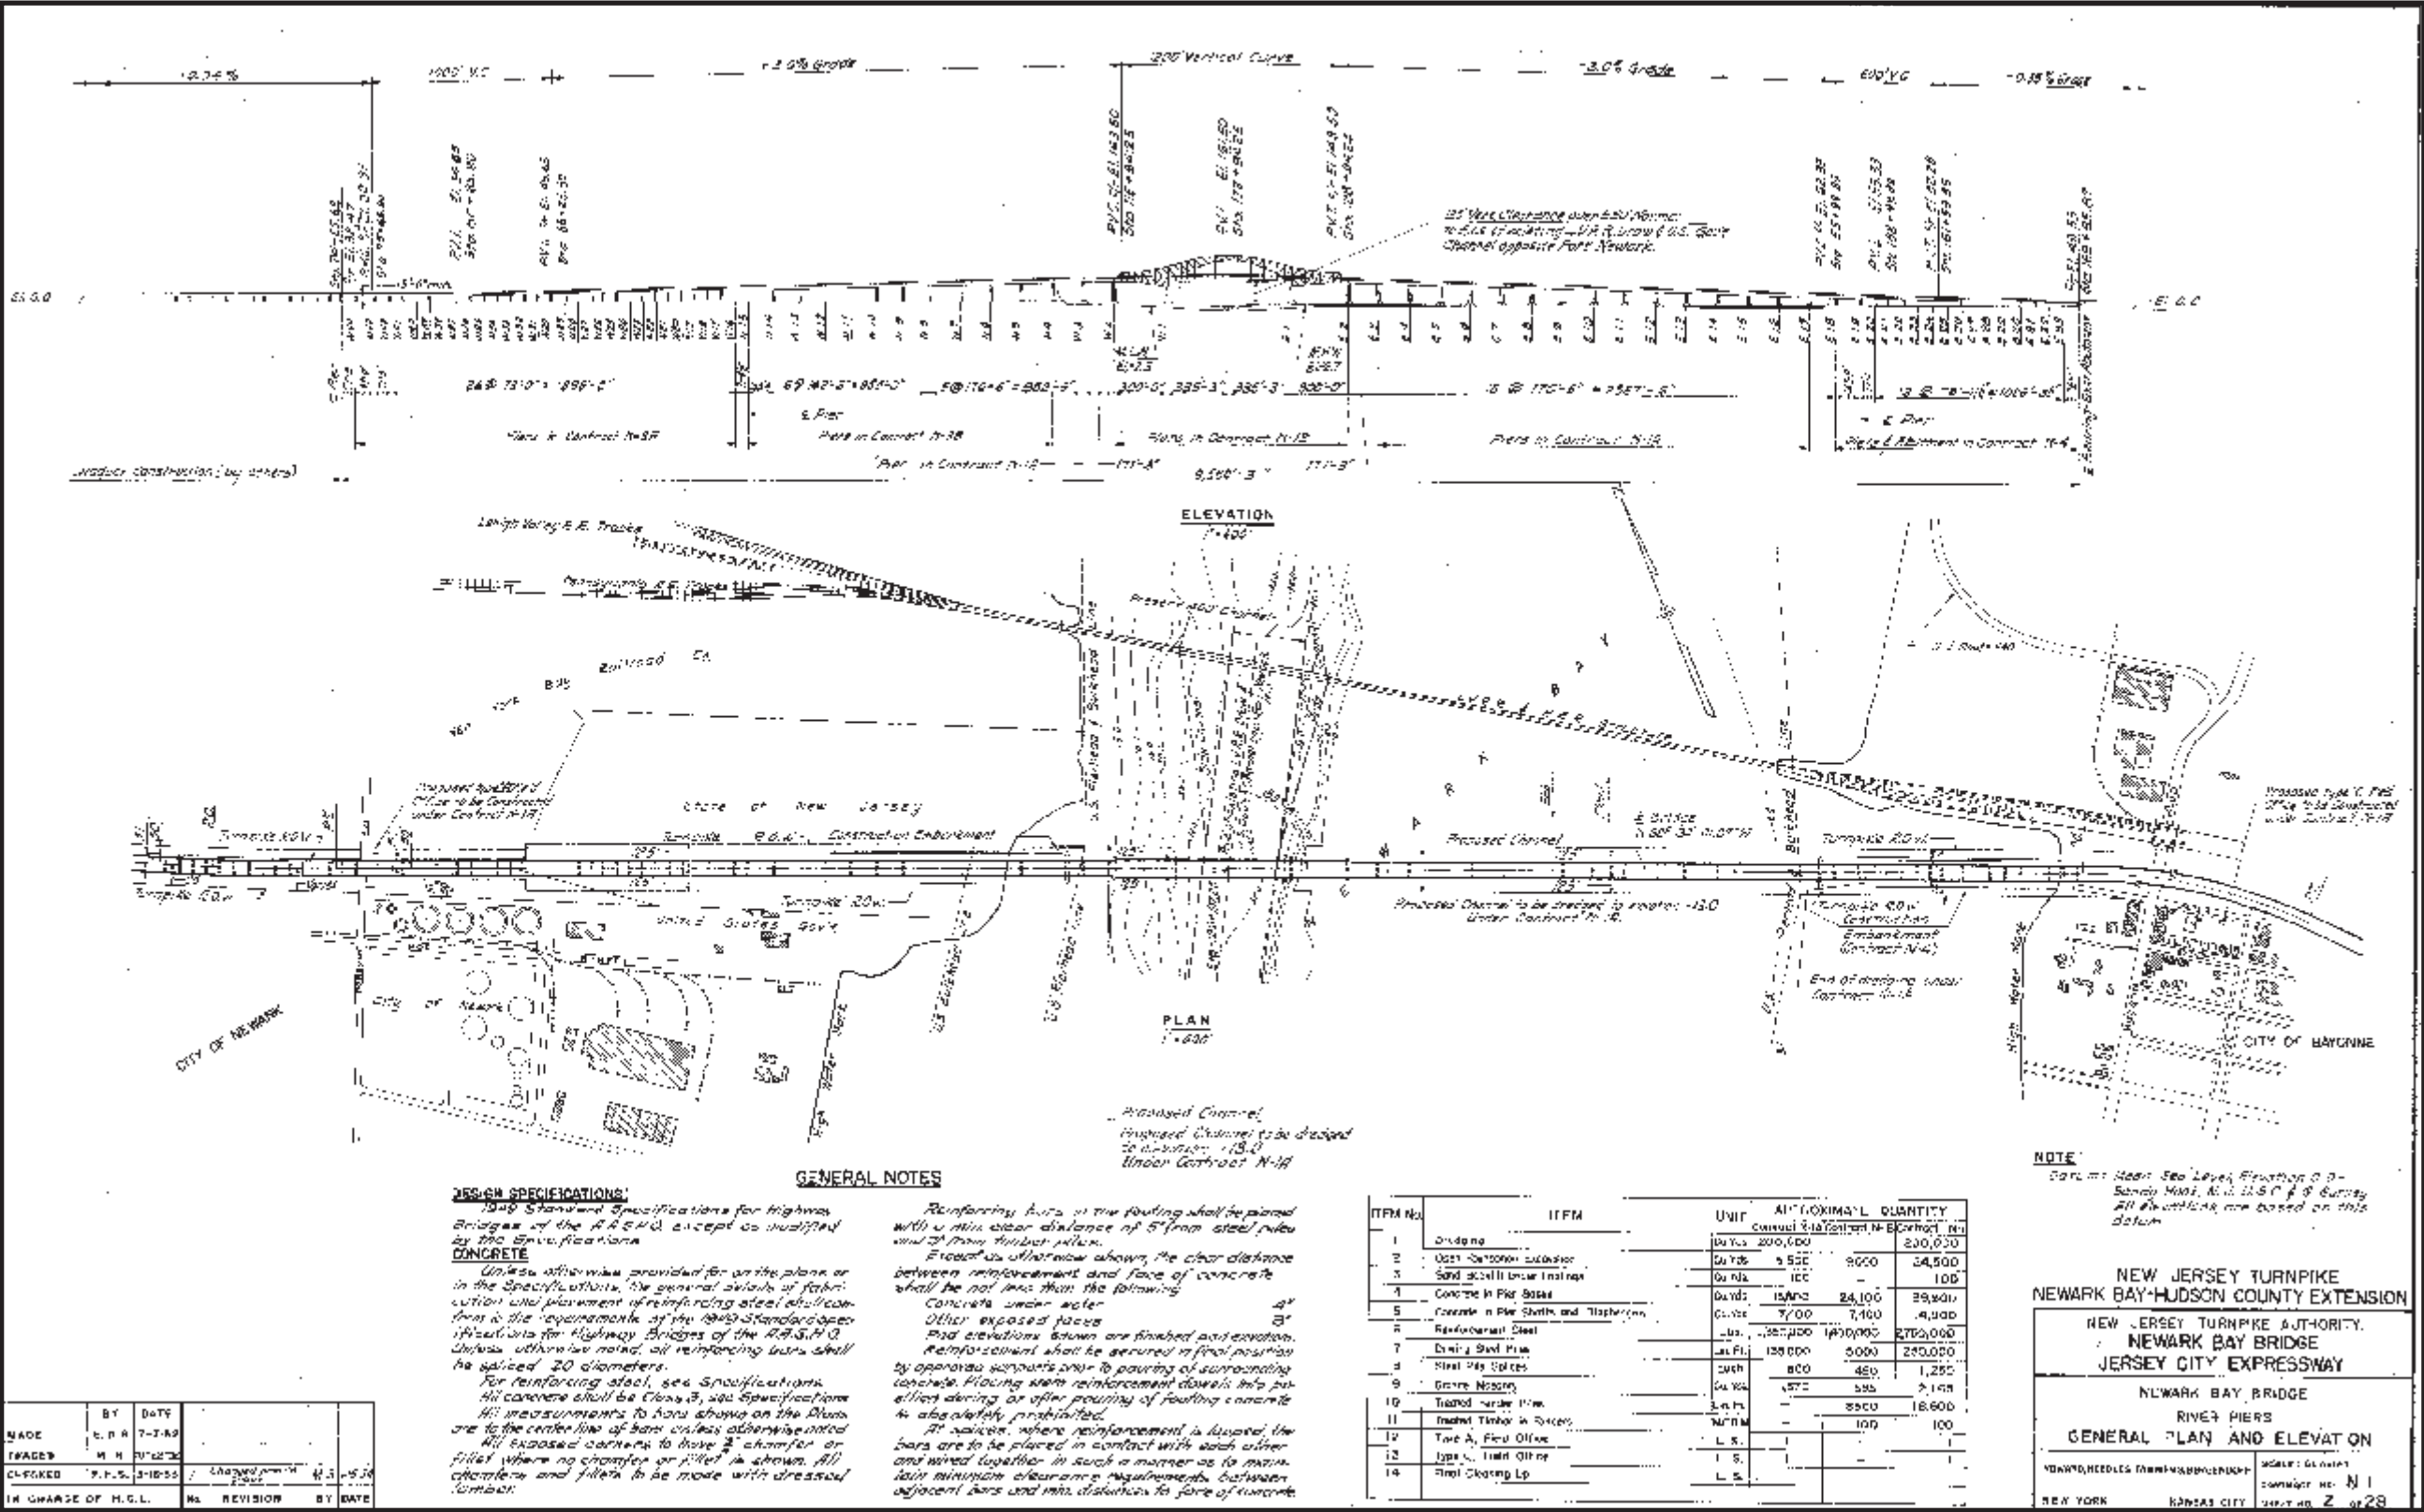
1952 drawing of the Newark Bay Bridge depicting a general plan and elevation. The bridge limits extend from Pier W44 (west limit) to the east abutment (east limit) (HNTB 1952a).
